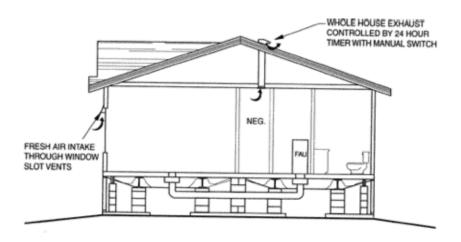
Cross section showing foundation support, crossover duct, and one type of ventilation system in a manufactured home.
